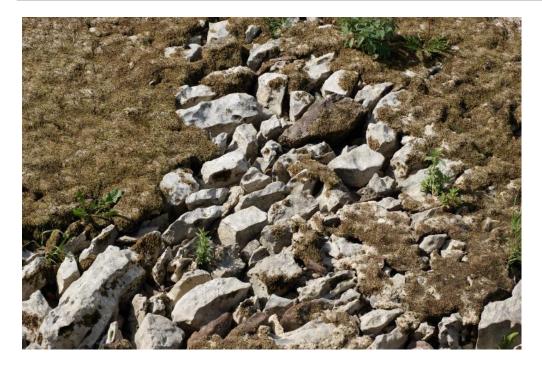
View of part of back slope to Crump Weir section showing spalled concrete apron exposing original Limestone blockwork under
